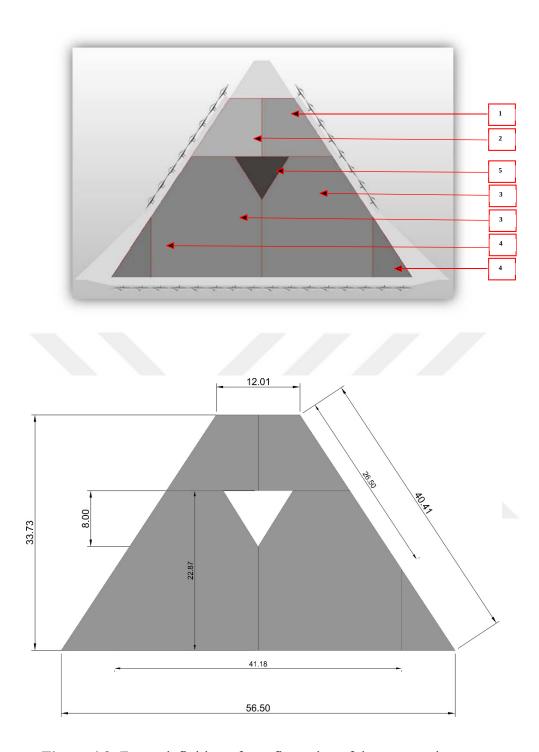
Zones definition of one floor plan of the proposed tower.
